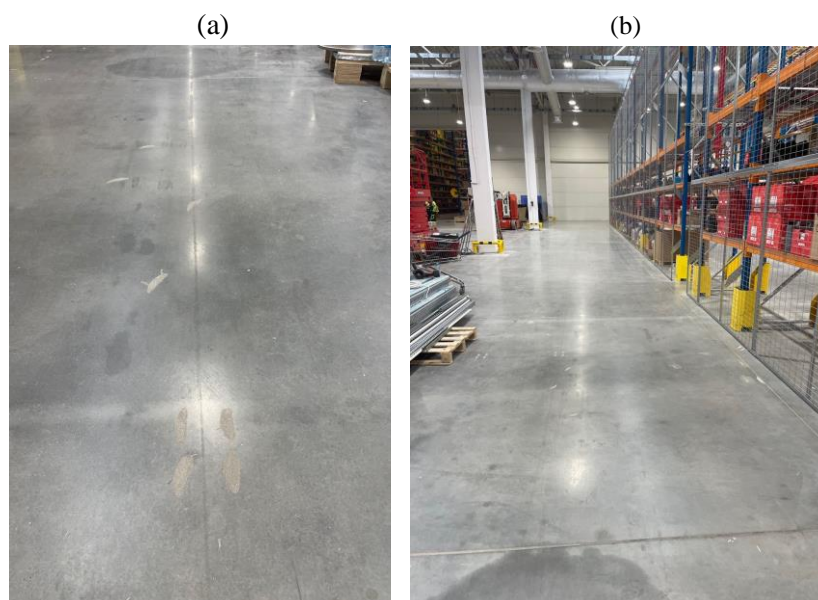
Concrete industrial floor (Example 4) after repair: a) visible gutting areas after anchors were cut out, b) general view after the facility was converted into a warehouse [38]
